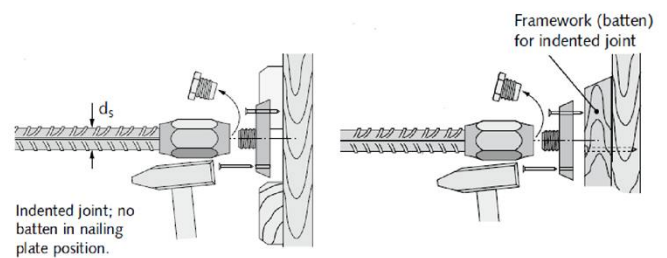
Fixing with nailing plate (formwork accessory) and creation of a recess for shear loads
